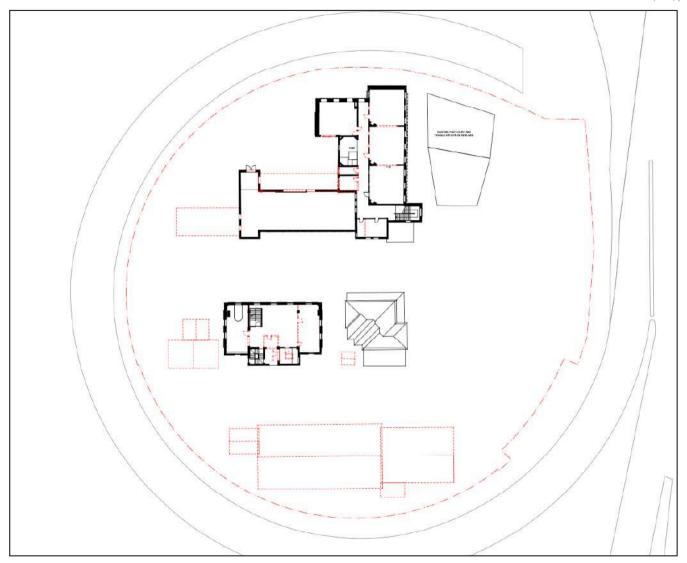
Demolition Plan – Level 1 (Source: FJMT Studio, DWG DA-2102, 18.12.2019)
